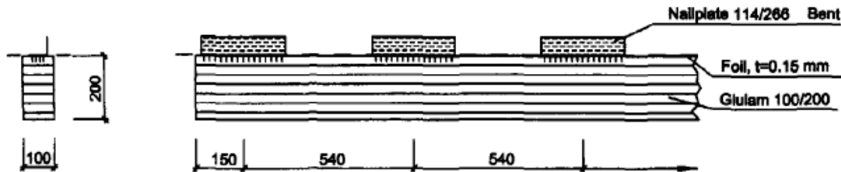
Shear connection for timber concrete with folded nail plate pressed first in the glulam beam (Van der Linden, 1999), (dimensions in mm).
